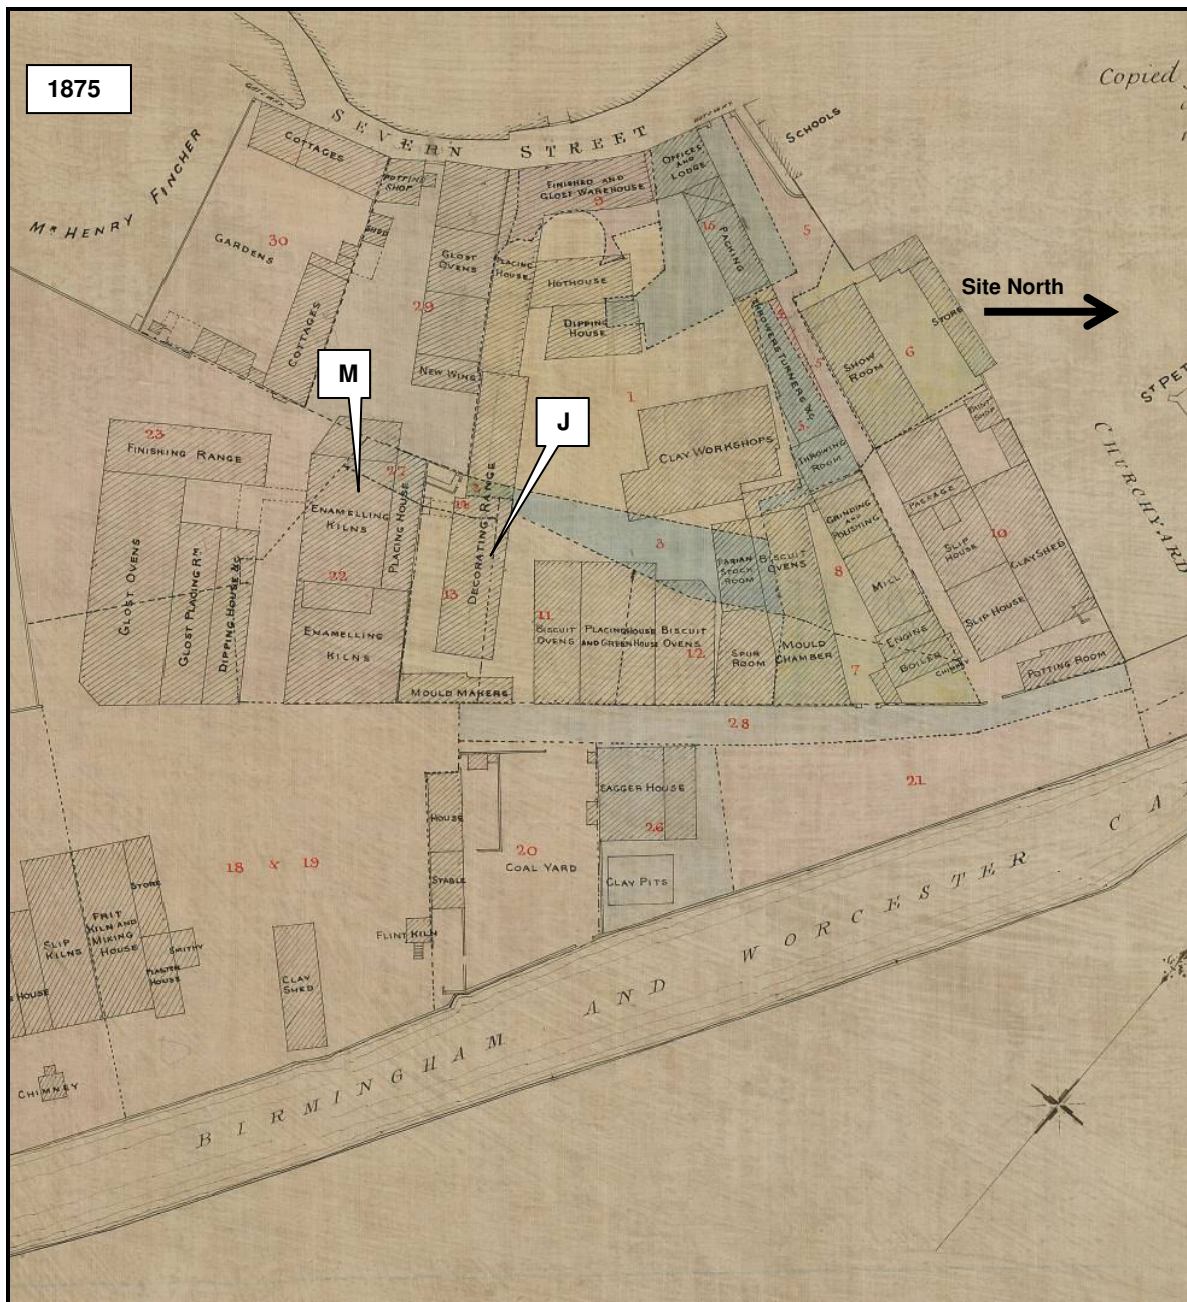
Plan of the Works in 1875 showing Building J (WPM)
